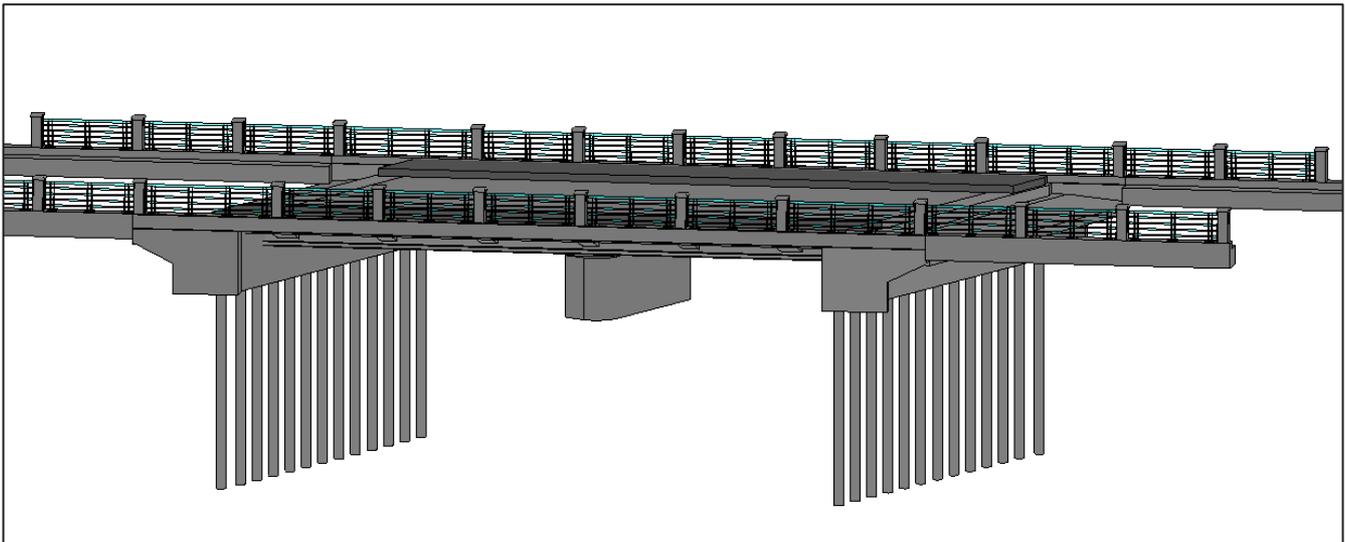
PROPOSED BRIDGE DESIGN (SINGLE 20 M DECK SPAN WITH PILED ABUTMENTS AND RETENTION OF EXISTING PIER (NON-FUNCTIONAL)).
